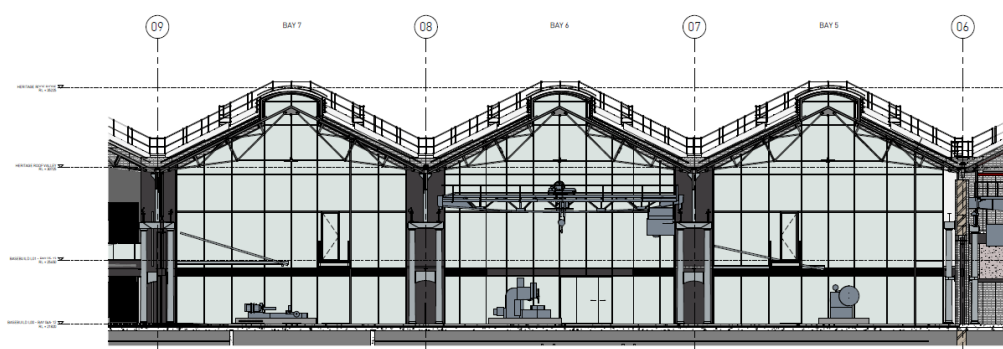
Full Height Glazing Elevation – Bay 5-7 North
